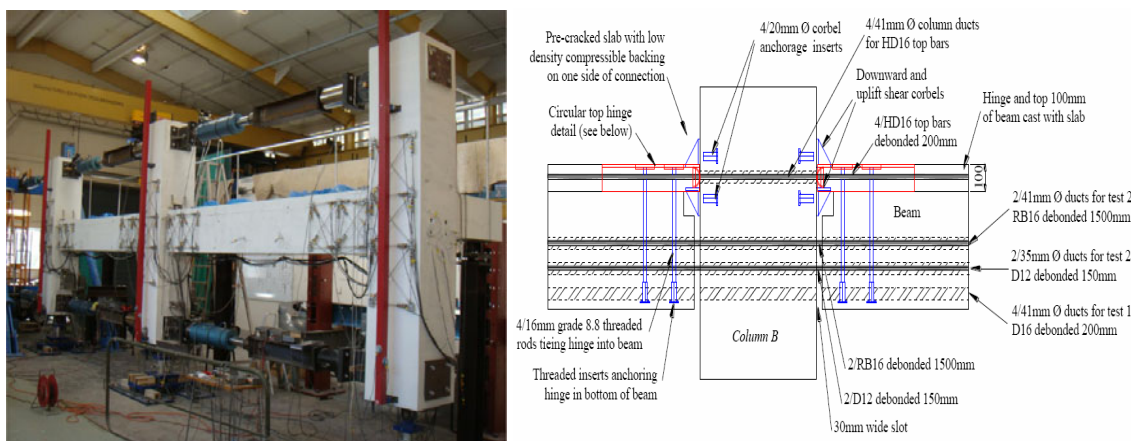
Experimental tests on 2-dimensional frame using slotted articulated floor (left) and interior beam-column connection details (right) proposed in New Zealand. [2.36]
